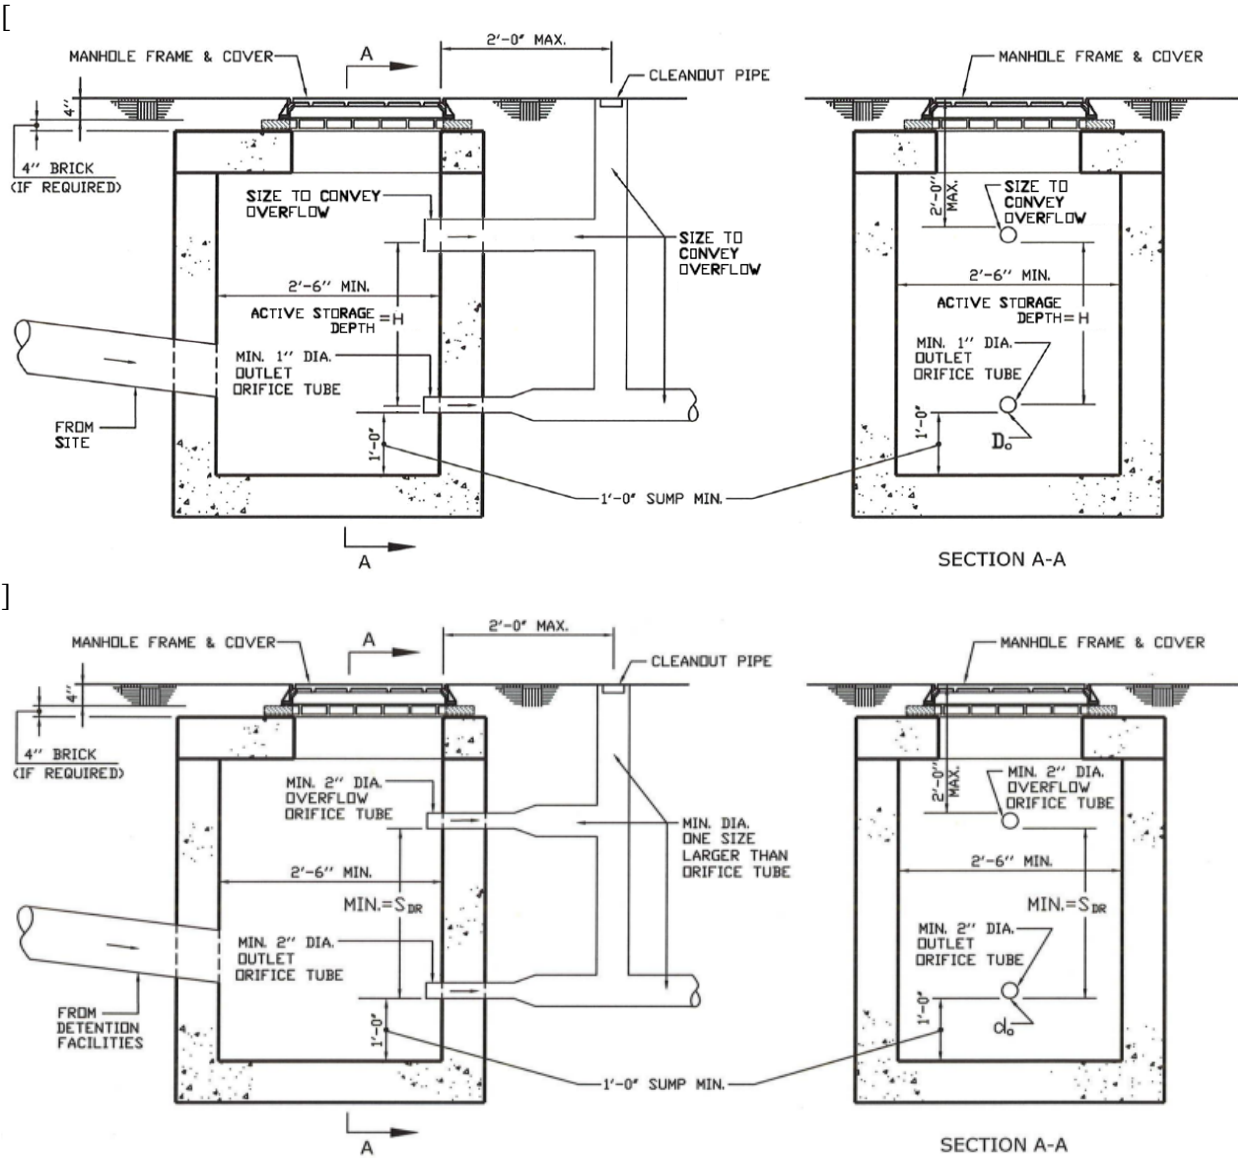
Outdoor Detention Tank with Re-Entrant Orifice
